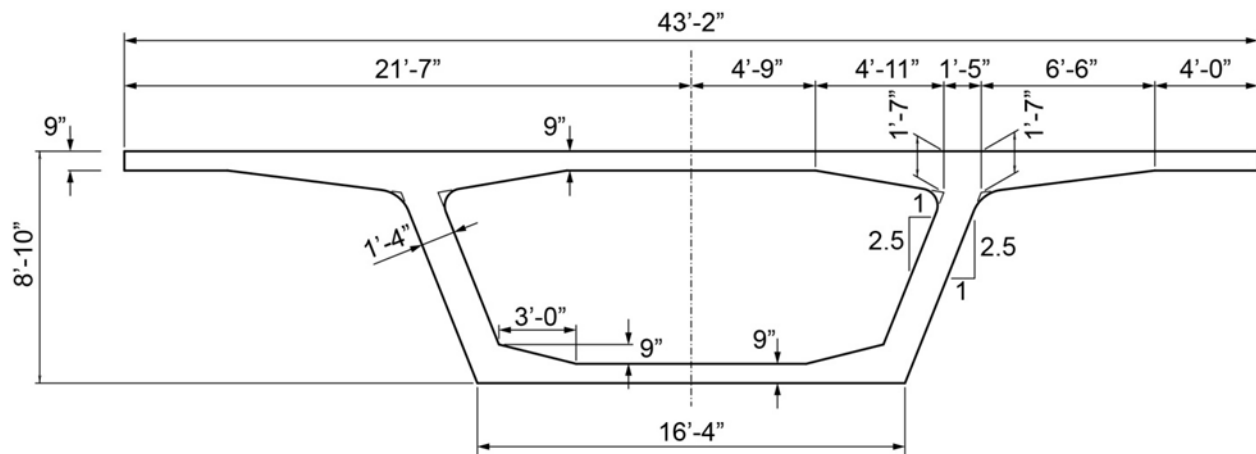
Typical Single-Cell Box Girder Cross Section Defined at Mid-Span
